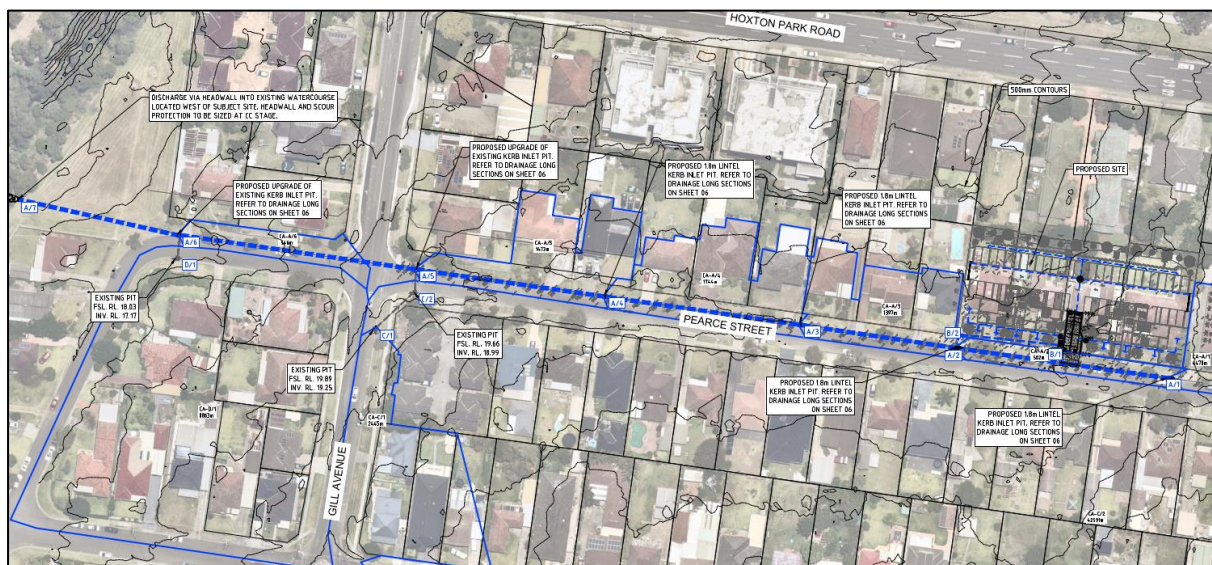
Extract of Stormwater Plans (Drawing No. 21106.DA.C09, prepared by SitePlus)
